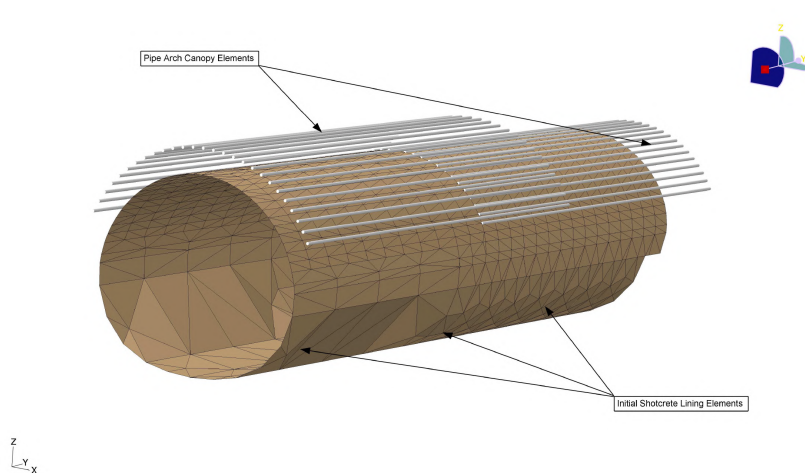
3-D Model Detailed View of Shotcrete Initial Lining and Pipe Arch Canopy Elements
